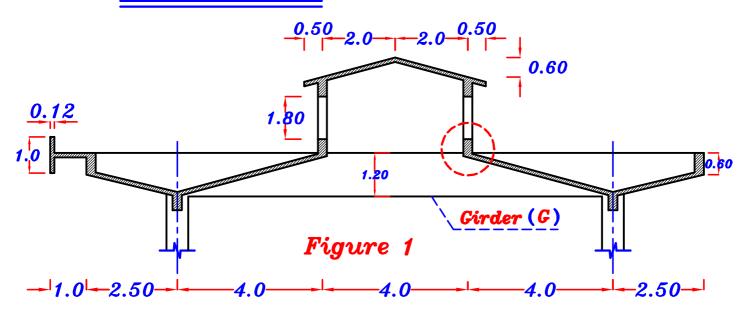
shows a sectional elevation of a reinforced concrete roof. The roof is covered by reinforced concrete slabs supported by a system of secondary beams. and Girders (G), spaced at 6.0 m.
